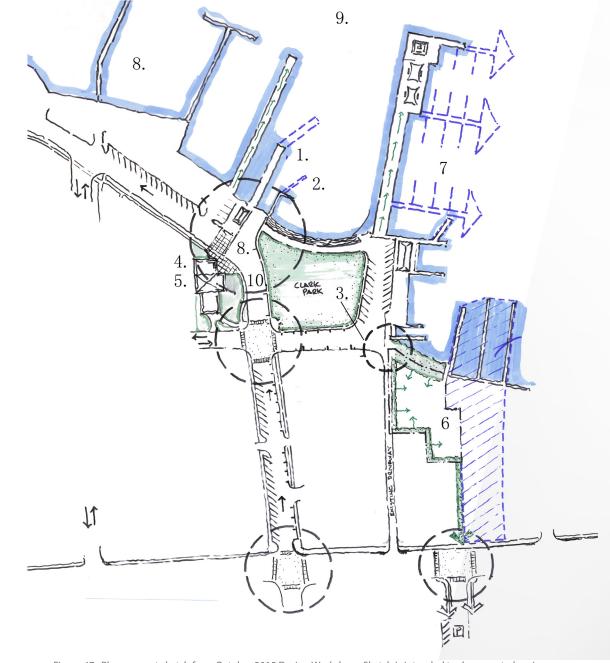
Plan concept sketch from October 2015 Design Workshop. Sketch is intended to document planning process and provide keyed locations for recommendations. Actual site design will require additional planning to identify preferred marina configurations and future land uses.
